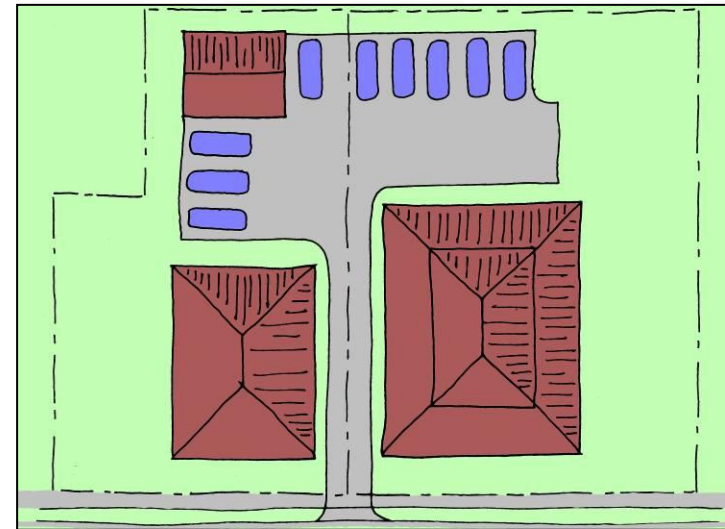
A single width driveway shared by adjacent lots with parking in the rear yard - minimizing the impact on the streetscape.
